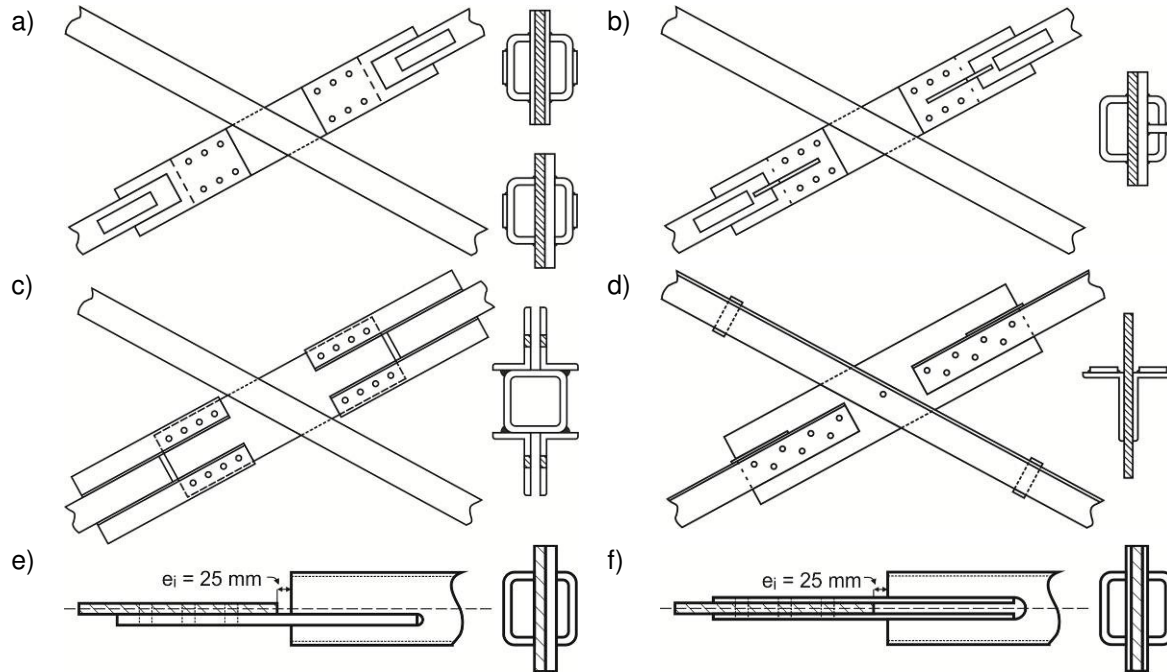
Mid-connection details: a) SS and DS connections for HSS braces (Specimens nos. 5 to 14); b) Specimen no. 9; c) Specimen no. 4; d) Specimens nos. 16 to 18 with double angle brace; e) Top view of HSS SS connection; and f) Top view of HSS DS connection.
